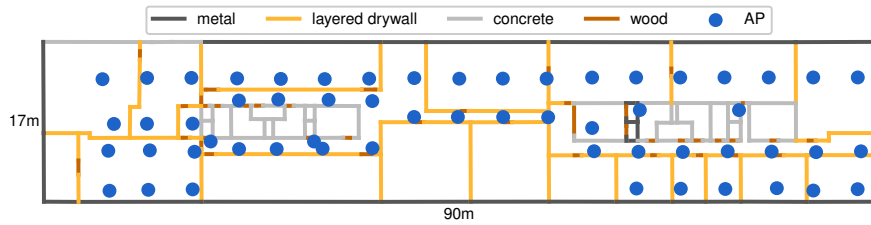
Floor plan with indication of the access points and the material of all walls and doors.
